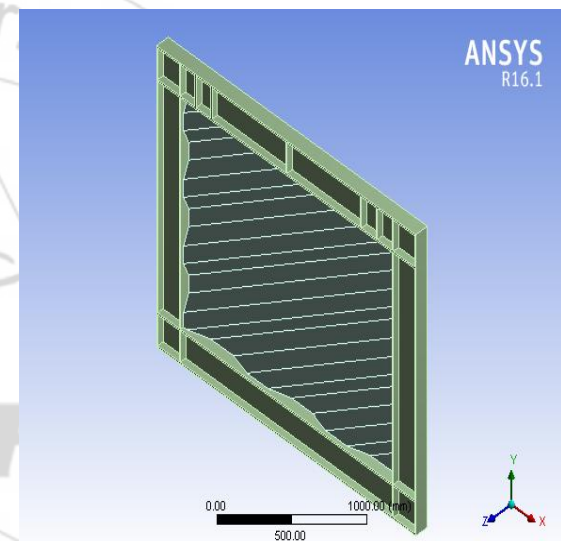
Trapezoidal corrugated steel plate shear wall with  $30^\circ$  corrugation angle
